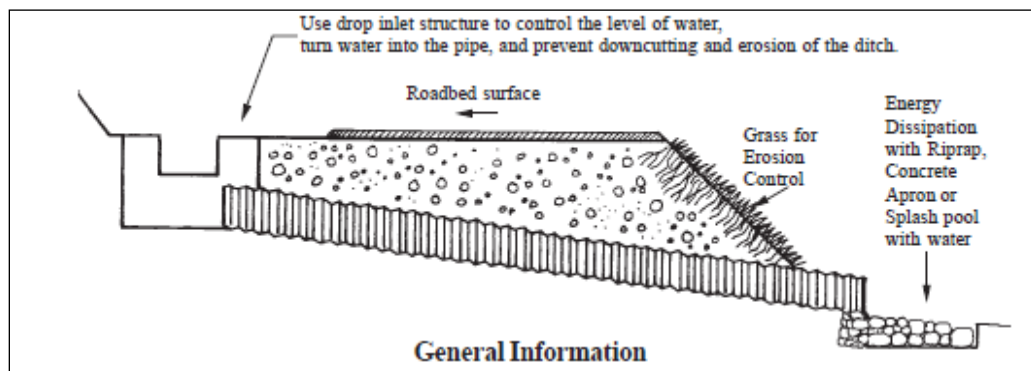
TYPICAL DROP INLET STRUCTURE WITH CULVERT CROSS-DRAIN. TAKEN FROM (KELLER AND SHERAR, 2003).
